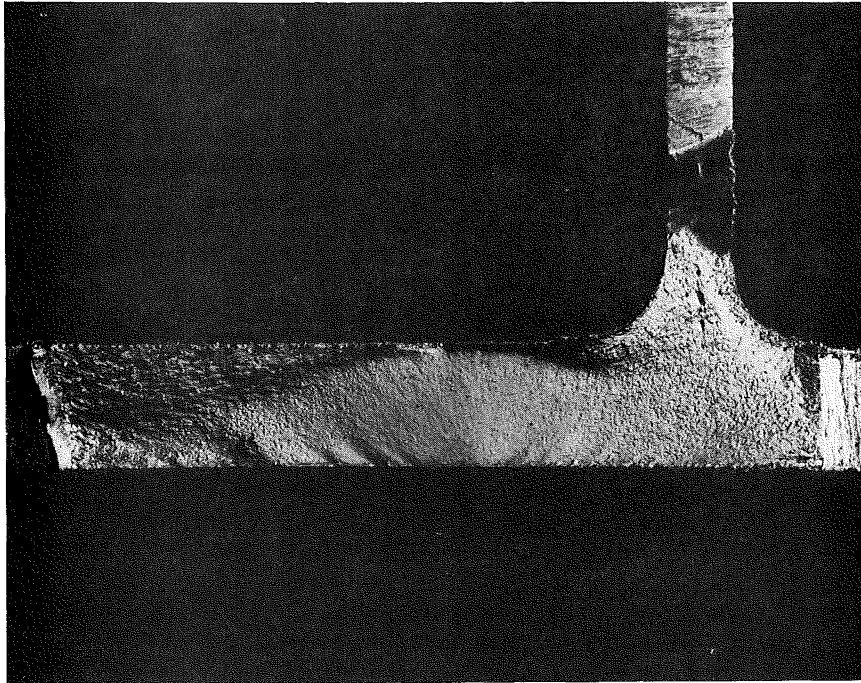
Crack Initiation from a Flaw in the Rolled Surface of a Plain-Rolled Beam
